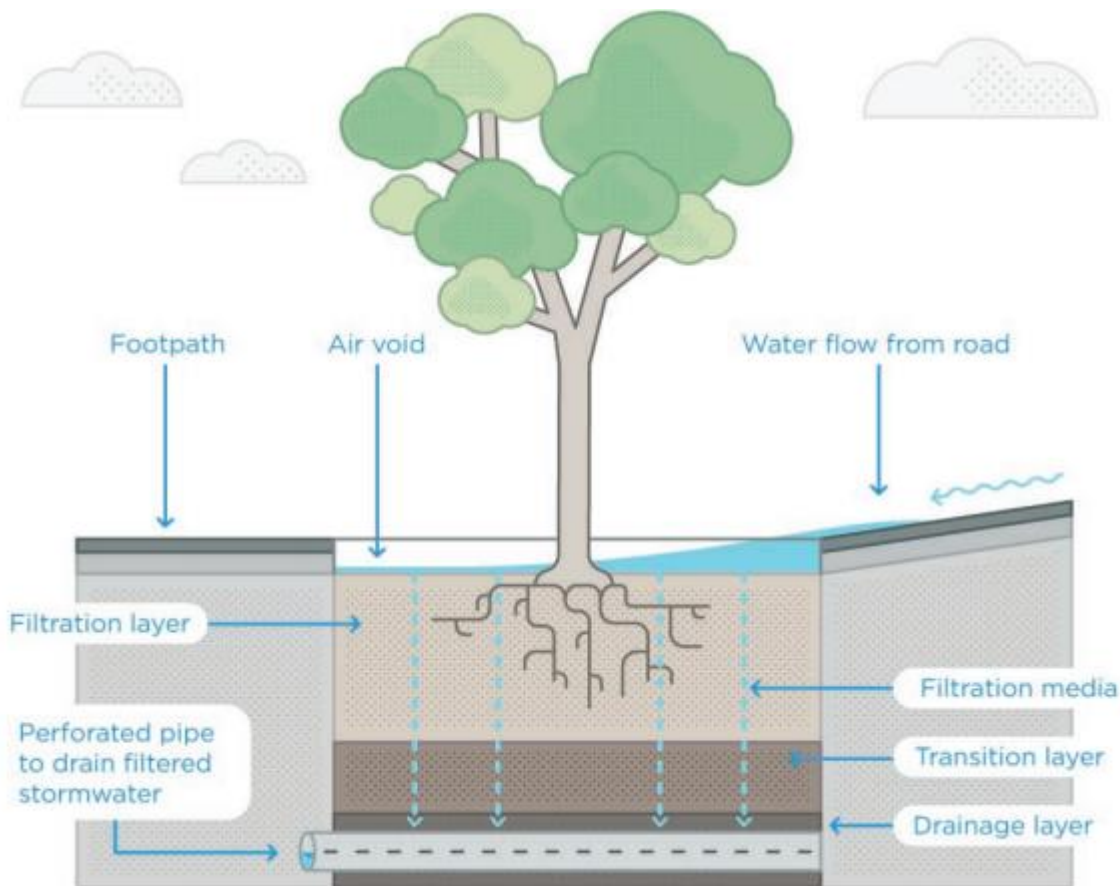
Concept Arrangement of a Tree Pit Bioretention System
